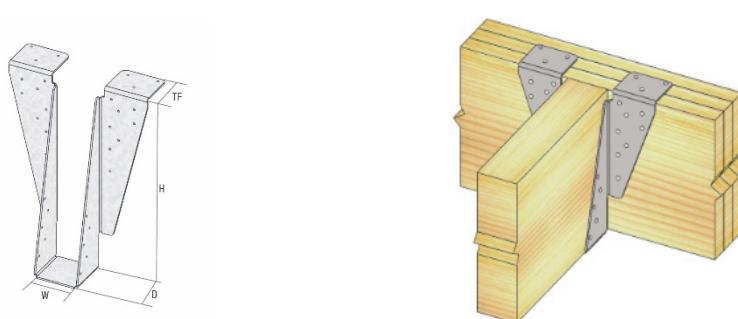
HBPH BEAM AND PURFLIN HANGER AND TYPICAL INSTALLATION DETAIL
